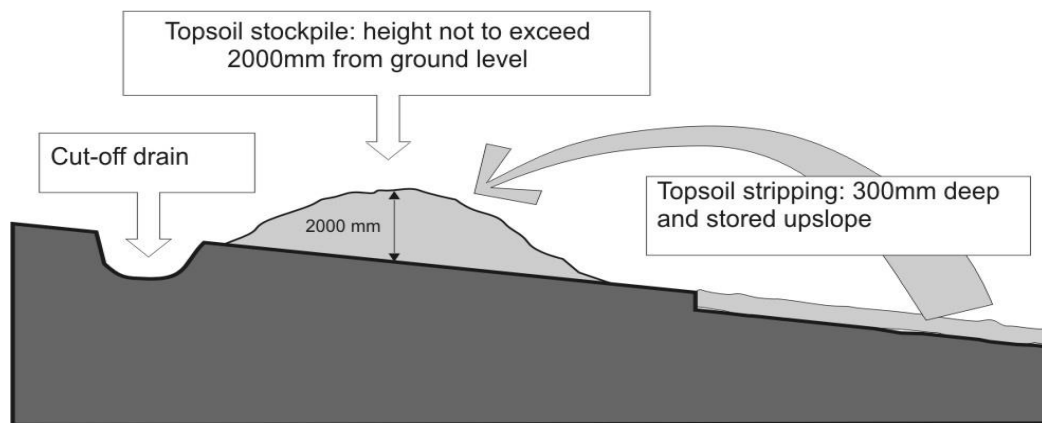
Section through a typical topsoil stripping and stockpiling operation
